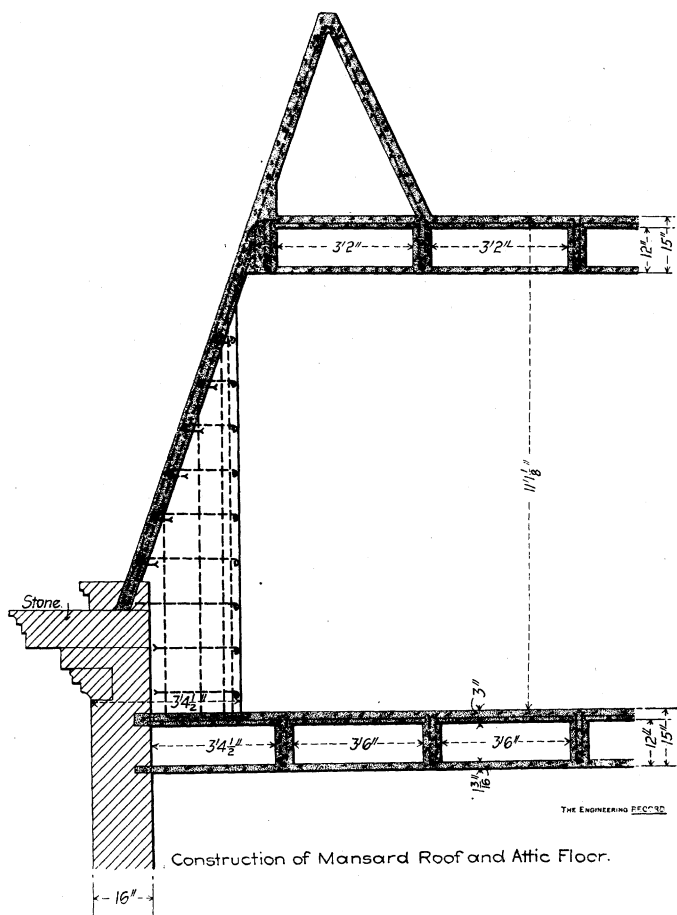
Mansard Roof and Attic Floor, W. C. Sheldon's Residence, New York.
